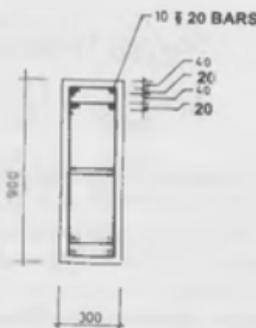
Design of a thin rectangular column section (10-bar arrangement).
